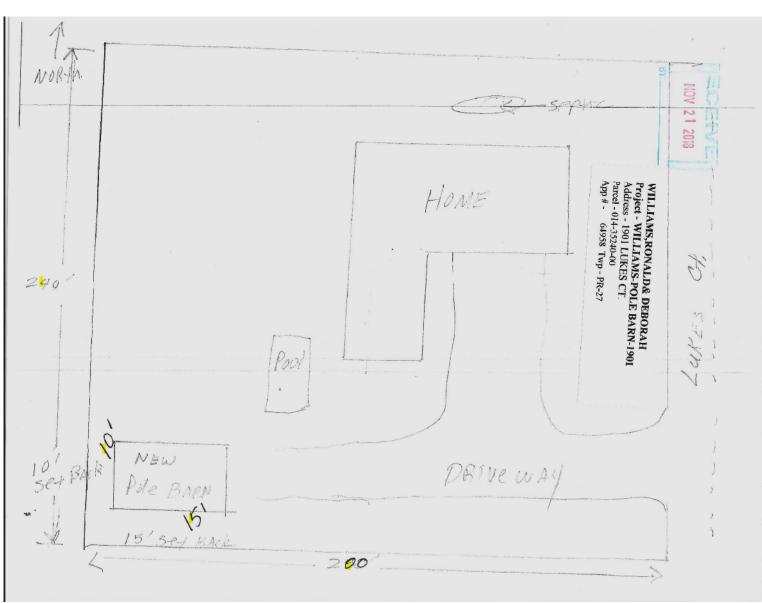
EXHIBIT SIX: Site plan from application for permit 18-RA-189
